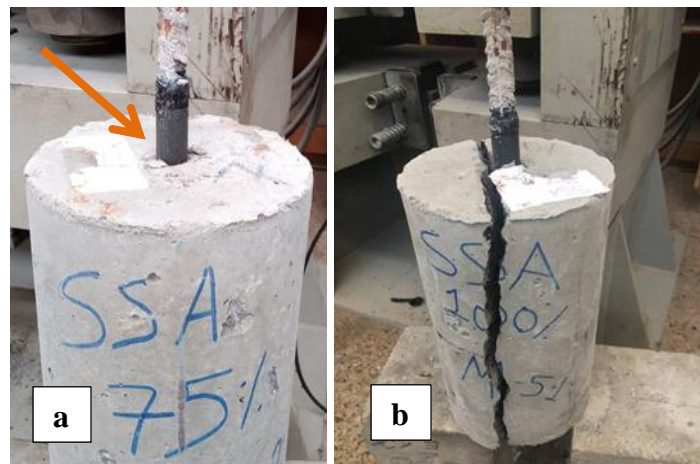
Bond strength failure mode: (a) pullout failure, (b) splitting failure
